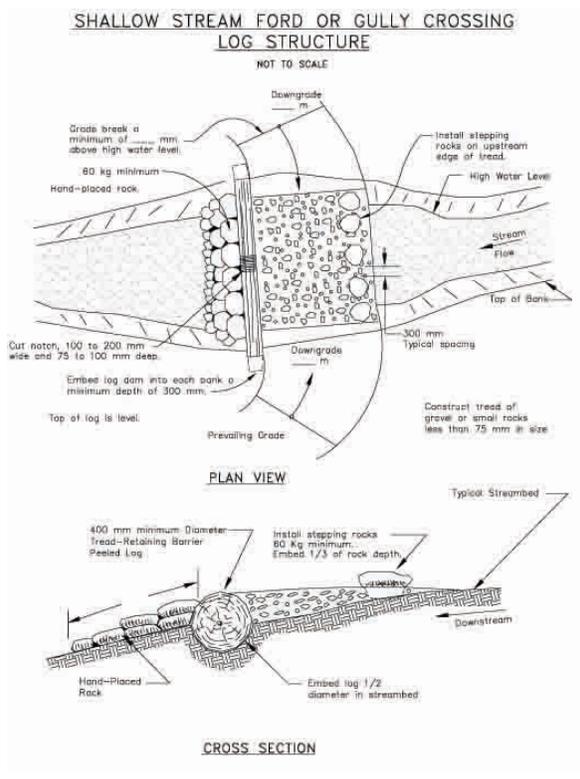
Typical Log Ford Drawing and Cross-Section.
